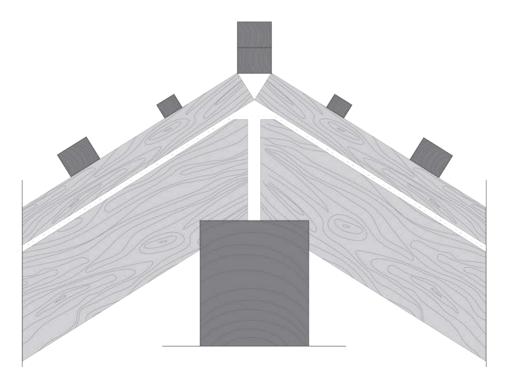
FIXING BATTENS FOR A HORIZONTAL RIGDE - SECTION
